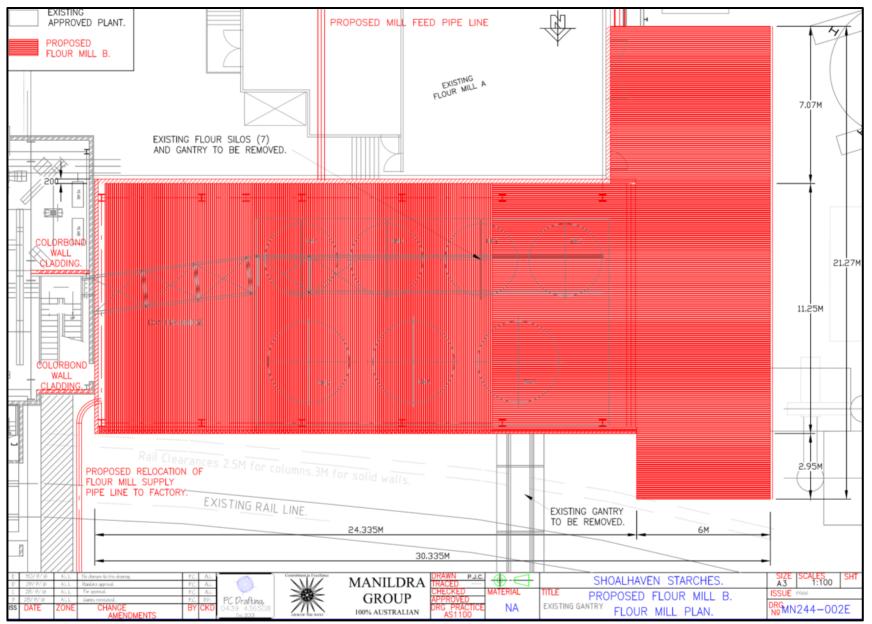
PROPOSED FLOUR MILL B PLAN
